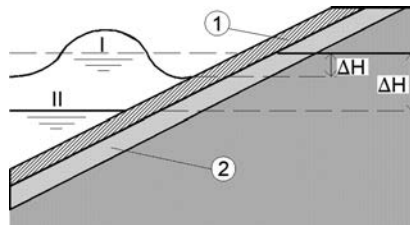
Uplift below the concrete slabs. (1) Concrete slab; (2) continuous drainage layer.
